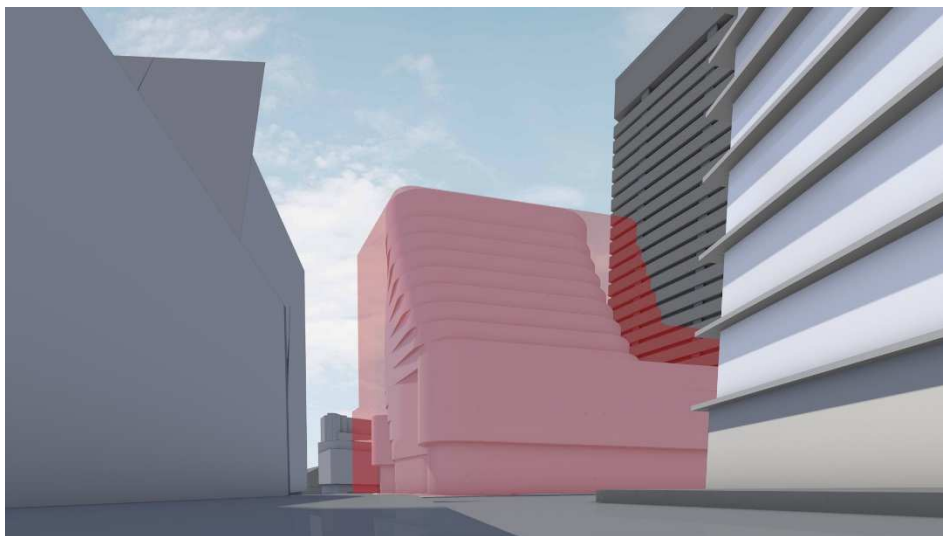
Approved building envelope framing CB02 Podium and Tower as seen from Chippendale Way
